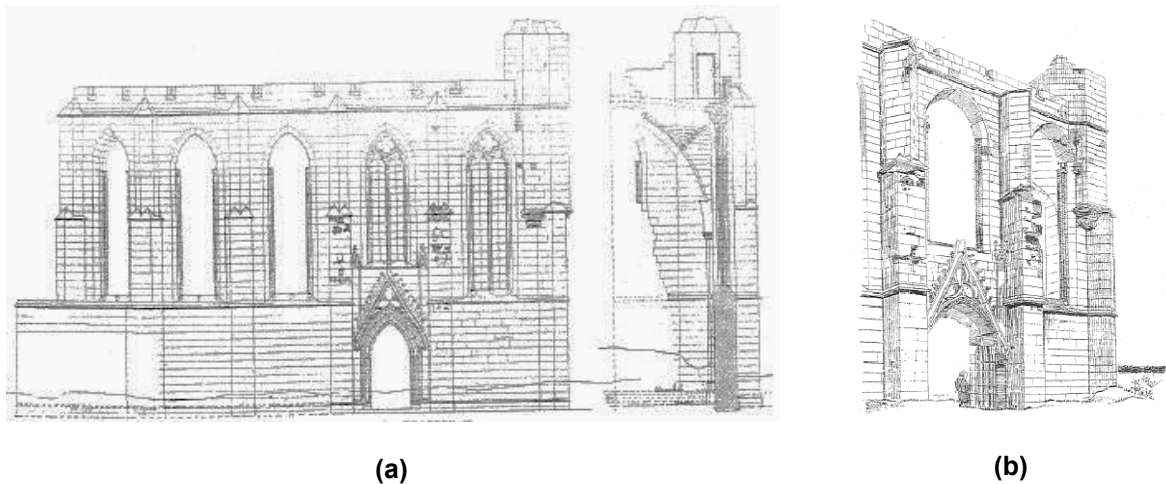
Drawings carried out of (a) Front view of north Façade and (b) details on façade's door (Kell, 1982)
